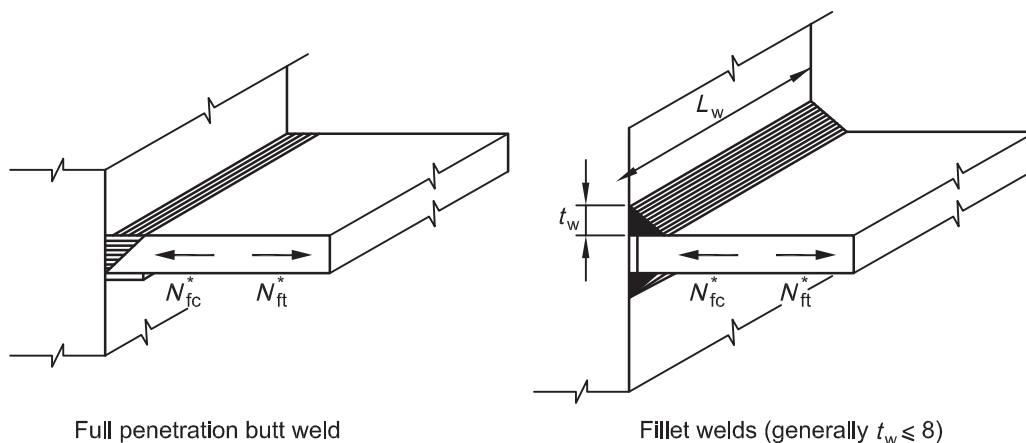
FLANGE WELD DESIGN ACTIONS
